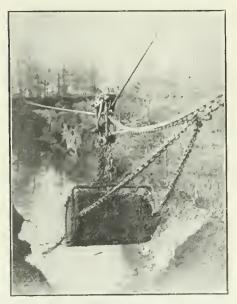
Drag-line bucket excavator filled and emerging from wet gravel pit.
